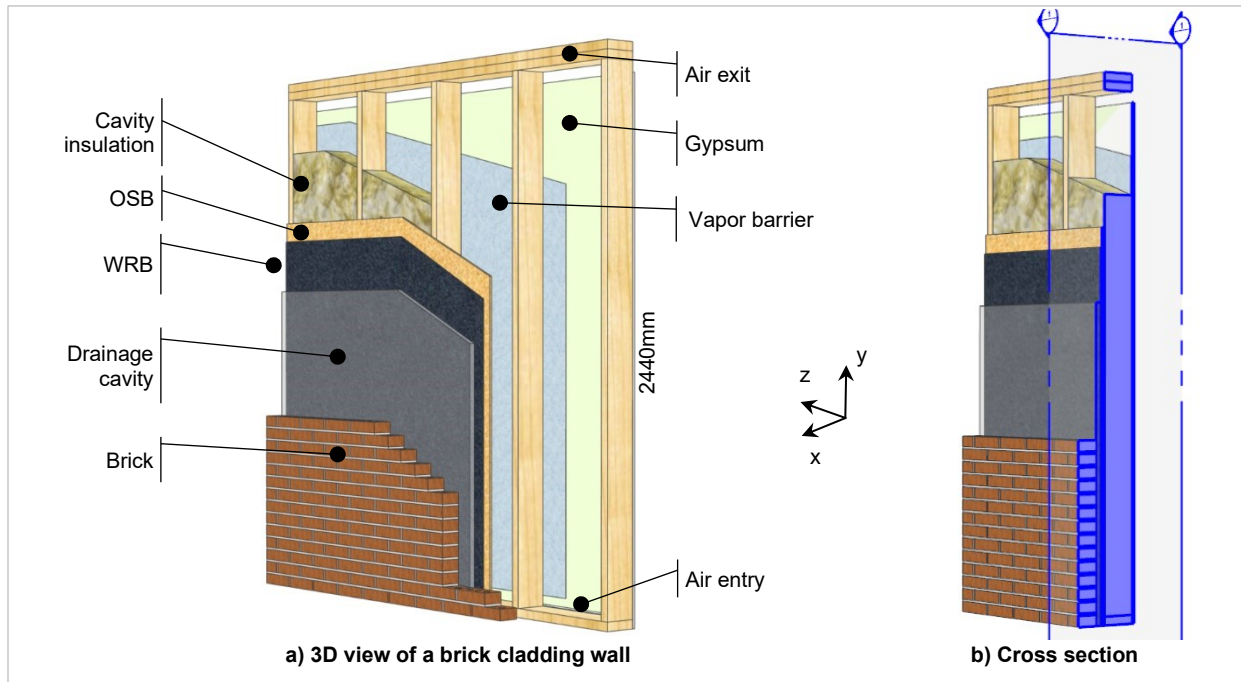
a) Typical composition of a brick cladding wall with the air entry at the bottom and air exit at the top; b) cross section.
